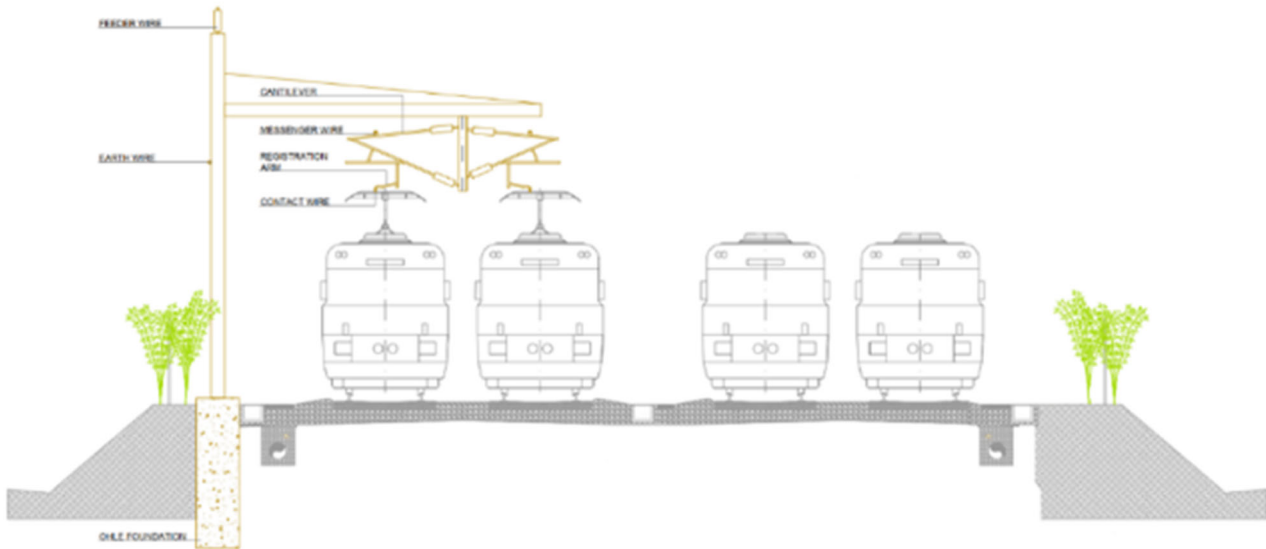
Typical OHLE TTC Arrangement in Four Track Open Route (Northern Tracks Electrified) - Facing East.
